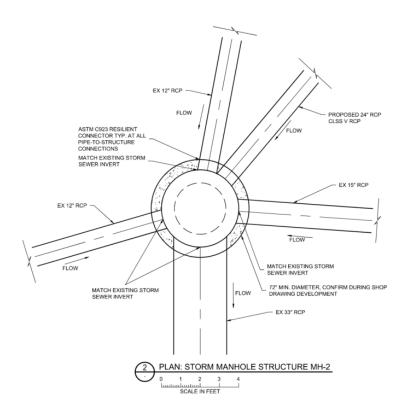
Excerpt from Drawings C-4.2 for Storm Sewer Manhole Structure MH-2
